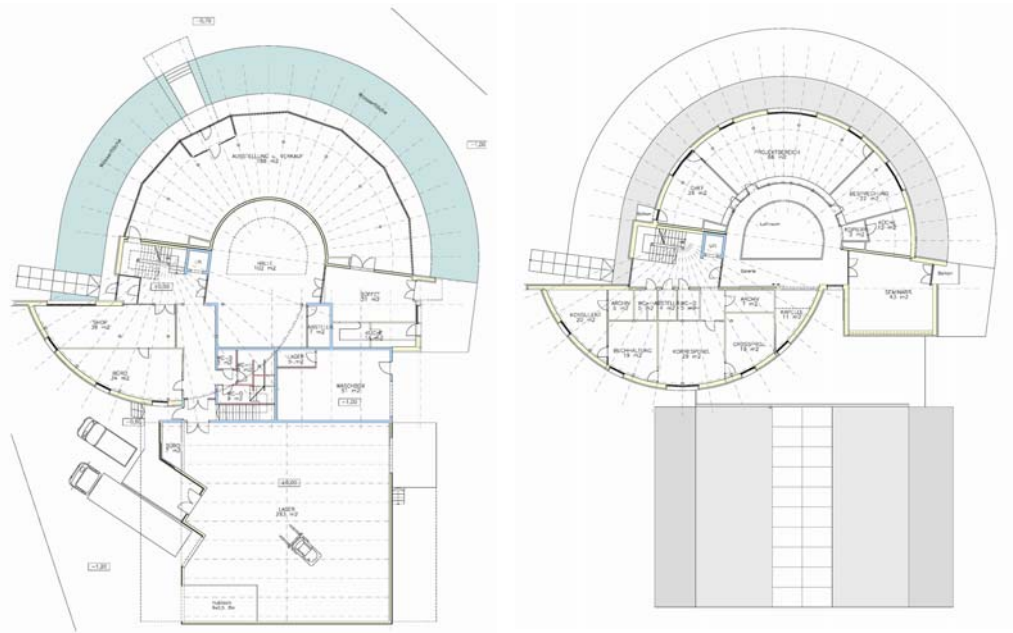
Architectural plan view of the office building, the ChristophorusHause" (left: ground floor, right: first and second floor, which are identical)
